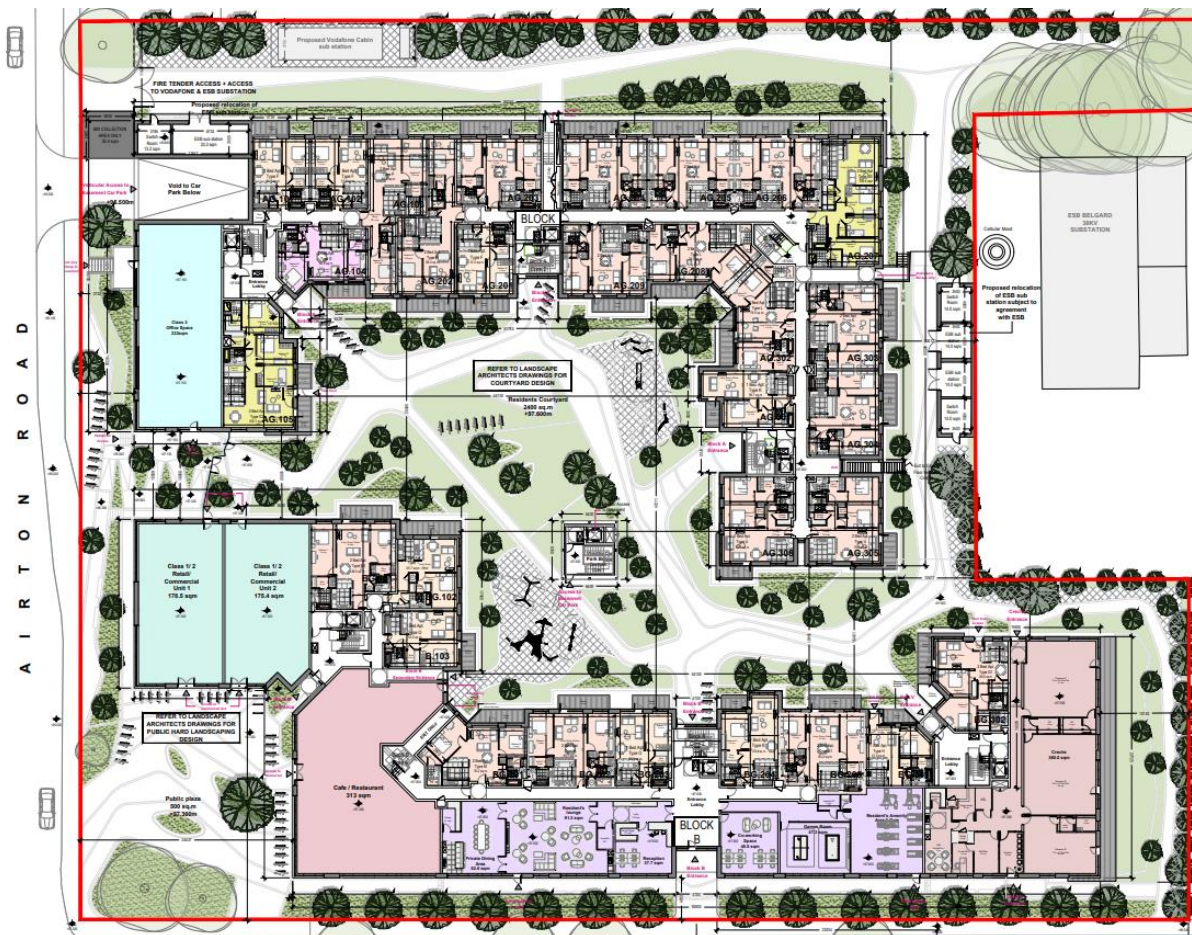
Ground floor layout plan approved under ABP Ref. ABP-305763-19
